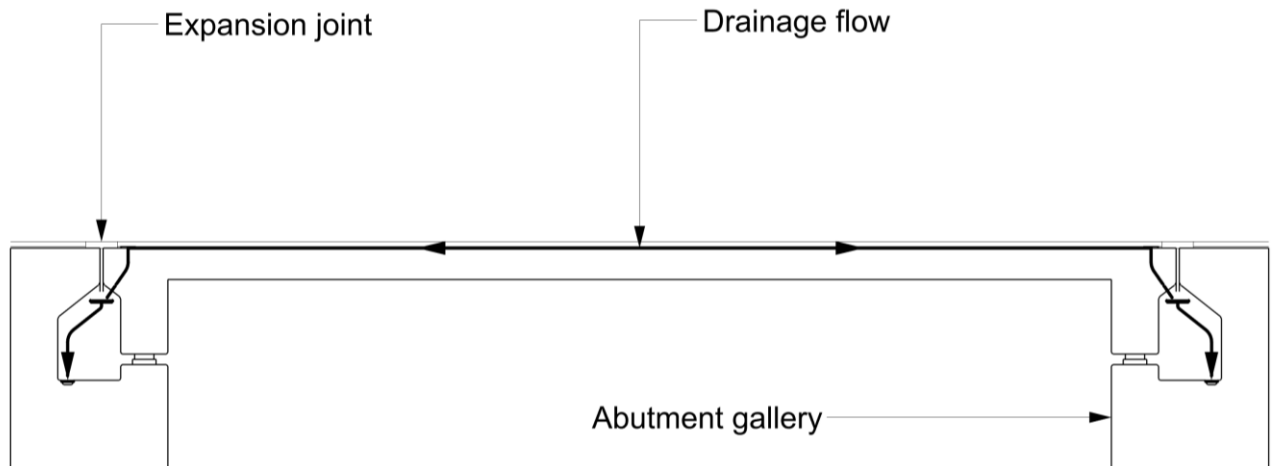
Schematic illustration for sub-surface drainage into the bridge abutment gallery
